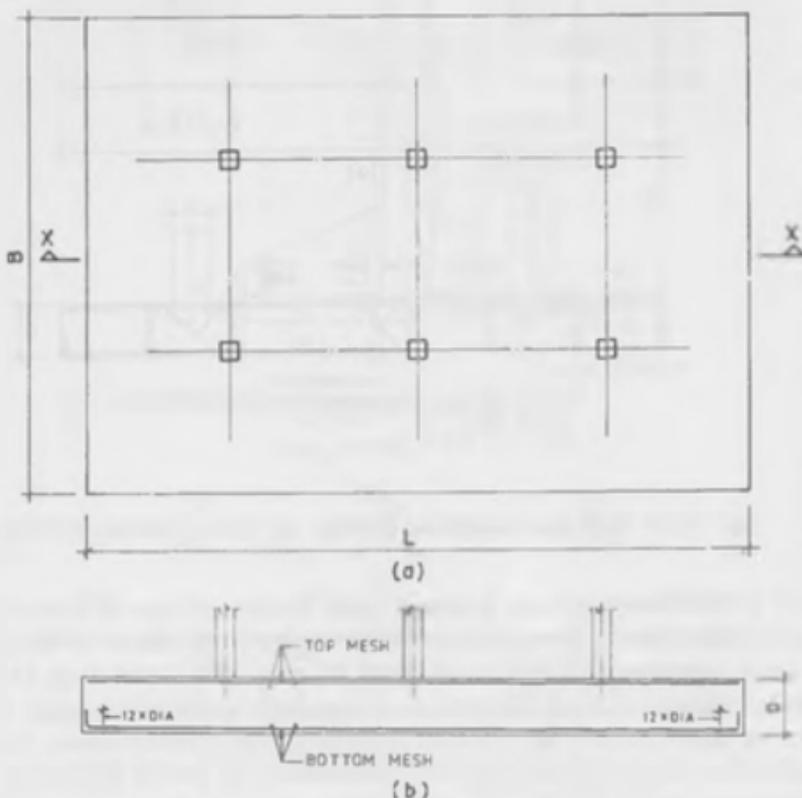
Slab-type raft. (a) Plan of raft footing; (b) Section X-X.
